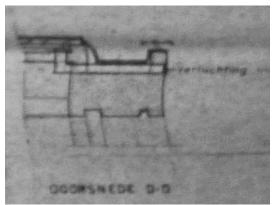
Detail ventilation roof (Antwerp: deSingel).
